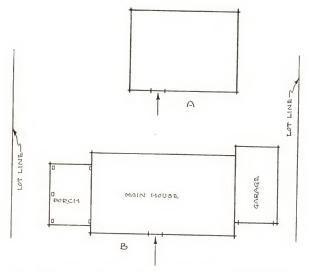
Small House Enlarged to Look Imposing on a Wide Lot
